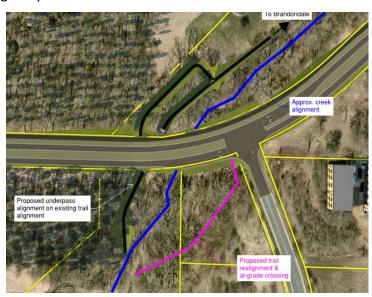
Proposed Trail Underpass near the Highway 10/Rayoux Road intersection.
